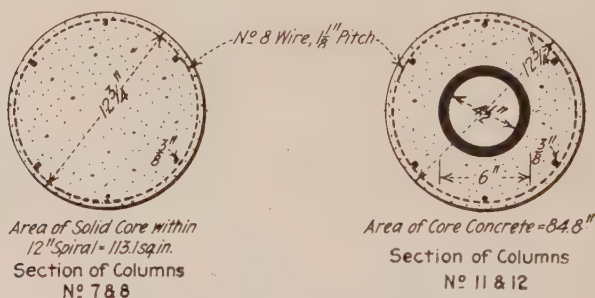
CROSS-SECTIONS OF COLUMNS 7, 8, 11 AND 12.
